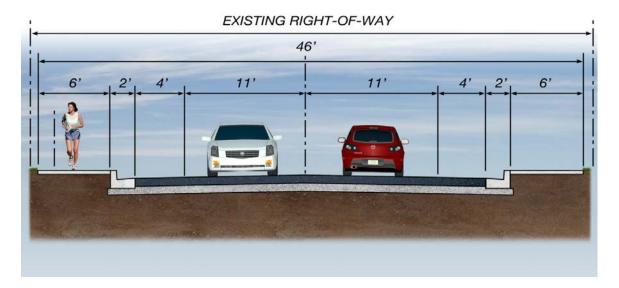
Proposed Roadway Section West of Proposed Movable Bridge
